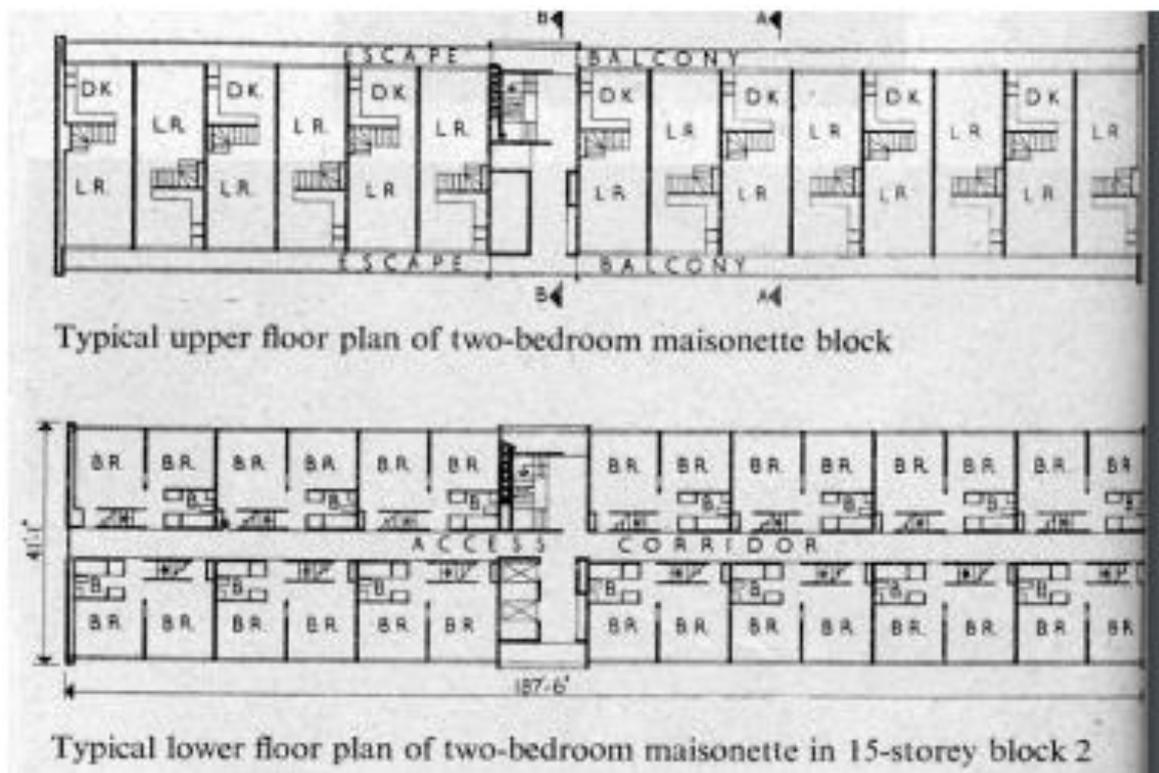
Architects Journal – Typical maisonettes upper and lower floor layout. Source: <https://www.architectsjournal.co.uk/news/sceaux-gardens-camberwell-the-original-1960-aj-building-study>
